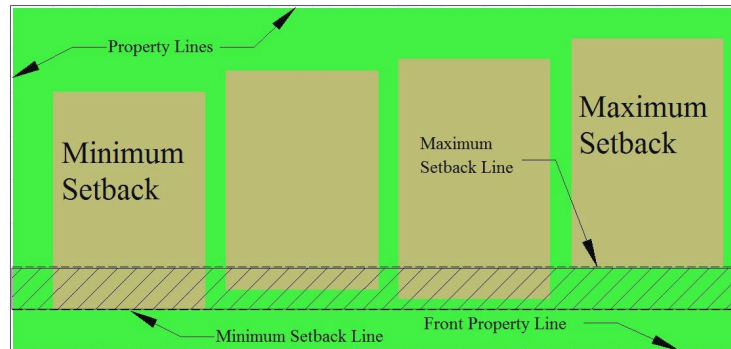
D(1) MAXIMUM BUILDING SETBACKS
